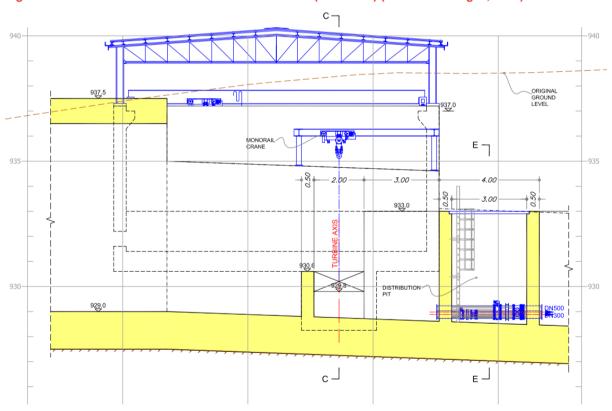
Powerhouse – Vertical Cross-section (Section D) (Studio Pietrangeli, 2019)
